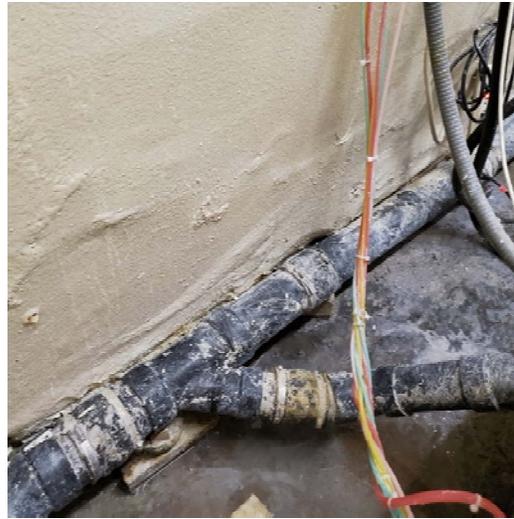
Water damaged wall systems are a common site in laundry and kitchen areas. Walls and floors in these areas should be as waterproof and chemical resistant as possible. Placing water resistant surfacing over water sensitive materials often causes more harm than good, as water “finds a way”, wicks up the susceptible material, and is trapped for an extensive time, allowing for degradation and mold development.
